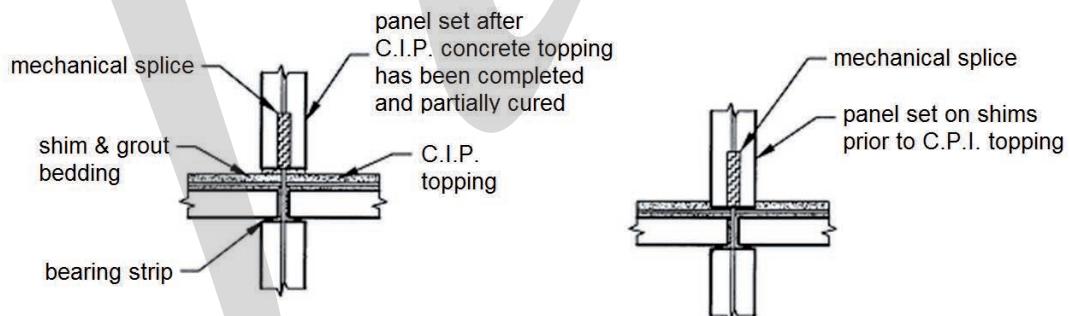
Mechanical splice for connection of two configurations of precast walls and floors. Welded and lapped splices must be located more than  $2h$  (where  $h$  is the floor thickness) from the face of the wall. Mechanical splices must be Type 2 if less than  $2h$  according to ACI 318-11 (2011) from face of wall (Authorized reprint from ACI 550.1R-09, 2009)
